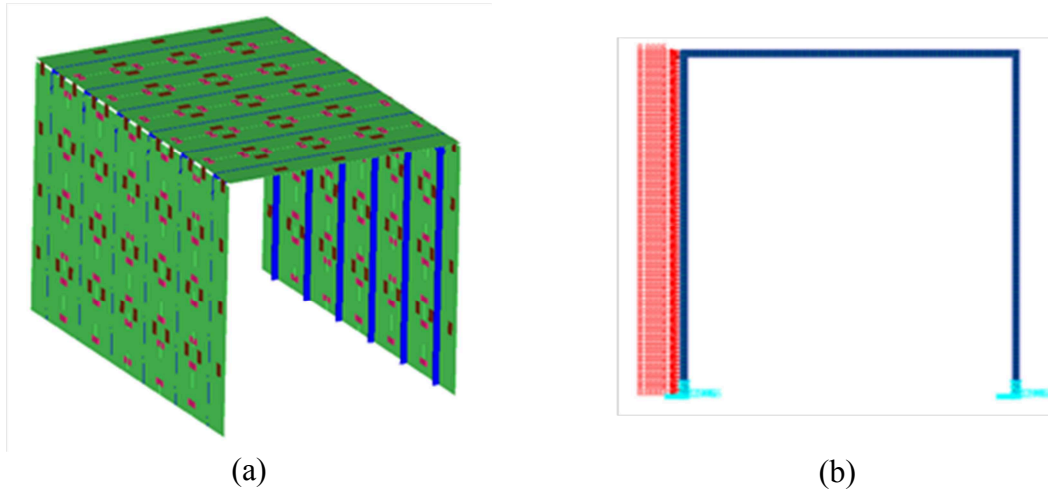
(a) The blastroom wall panel configuration; (b) The boundary and load condition
